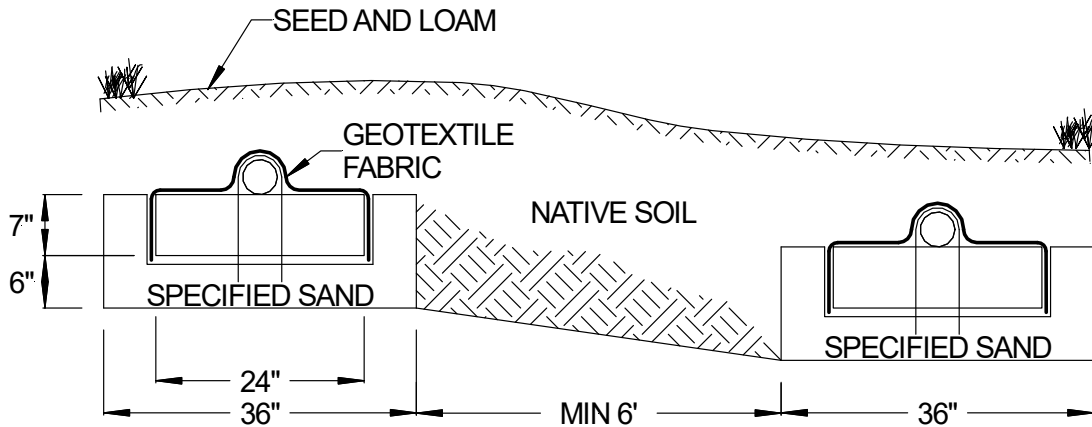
SECTION VIEW – TRENCH SYSTEM – SLOPING SITE
